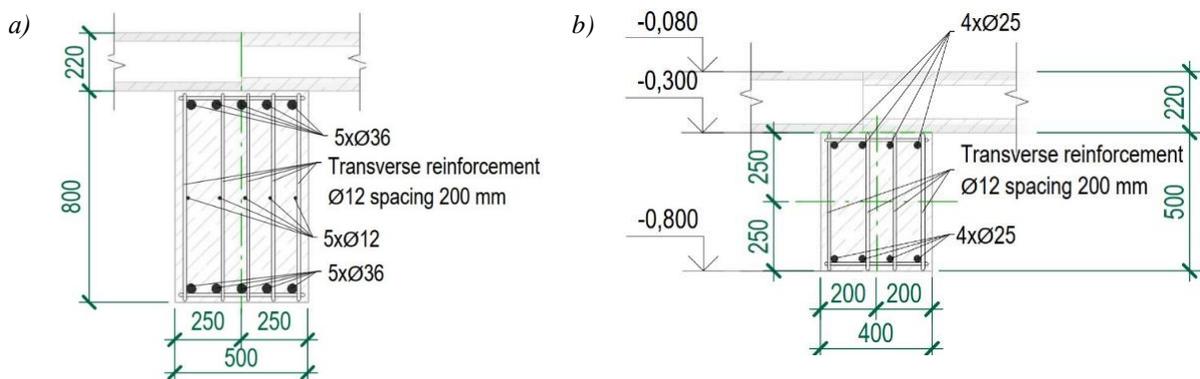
Detailing of existing beams based on instrumental survey results: *a* – 12 m span beam; *b* – 9 m span beam
